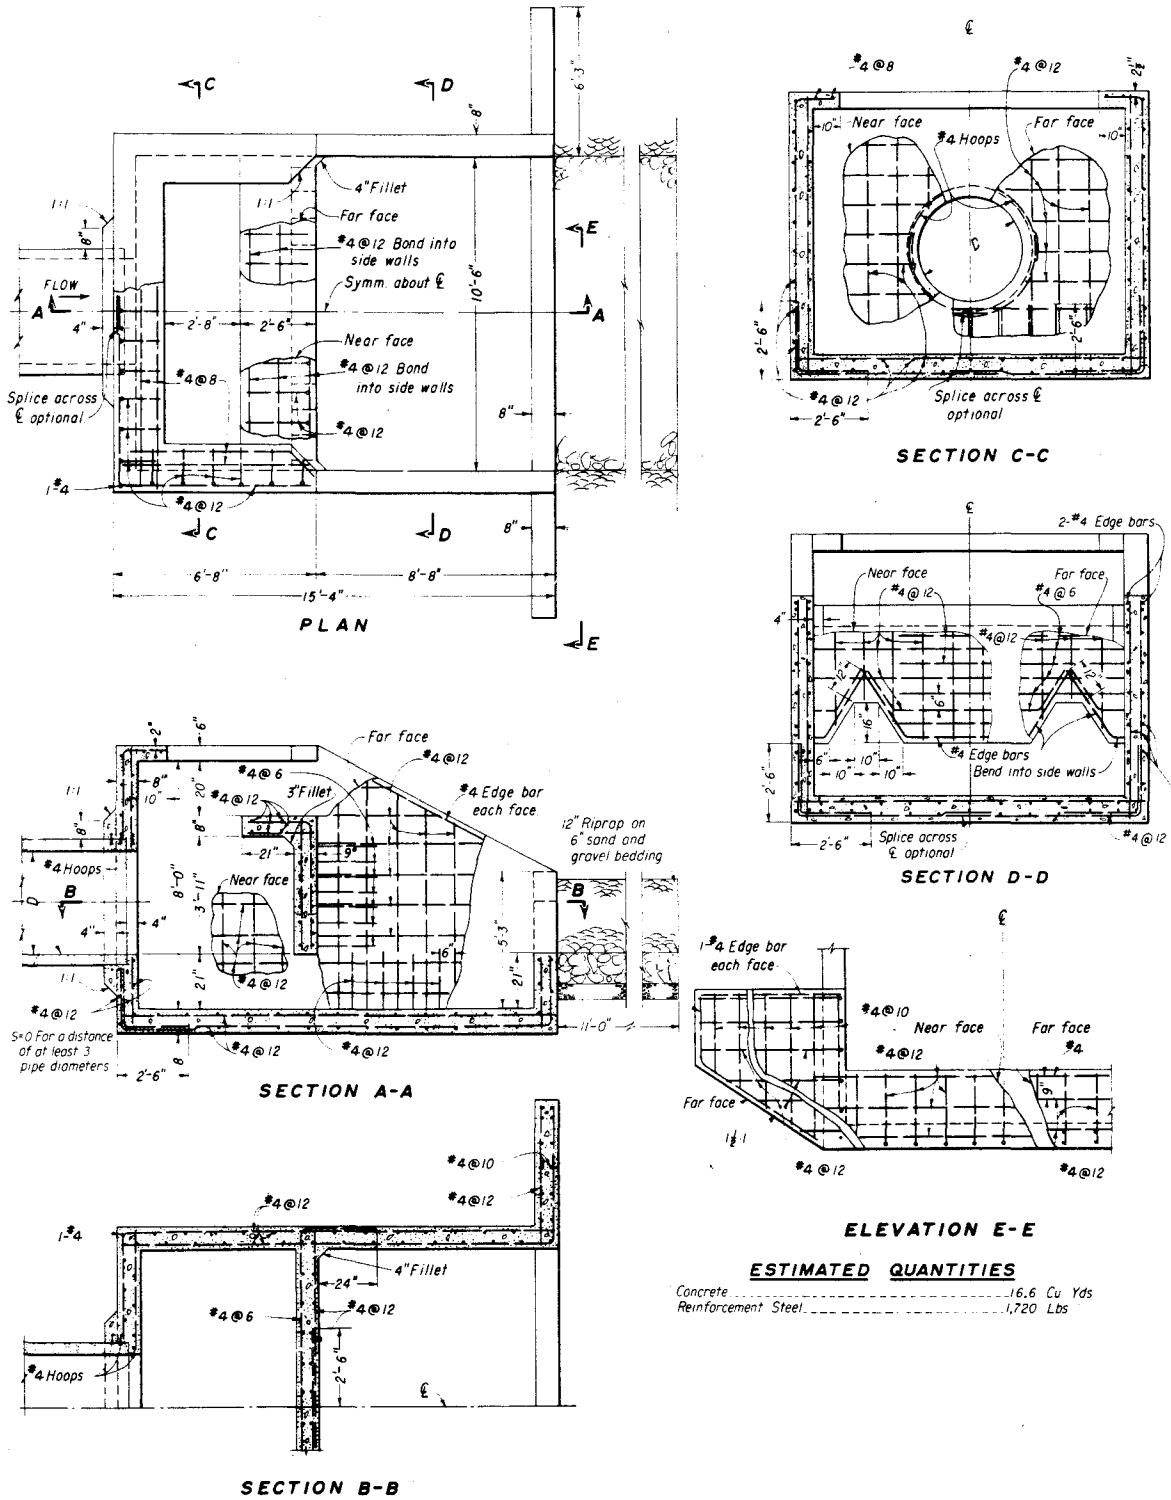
Type 7 baffled outlet. 103-D-1346
